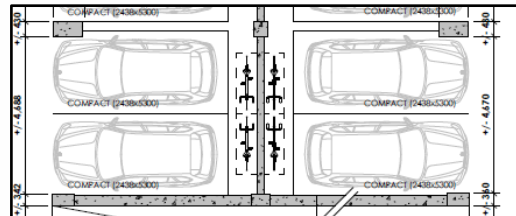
Example of bicycle parking located in front of vehicular parking space in the underground parking garage
